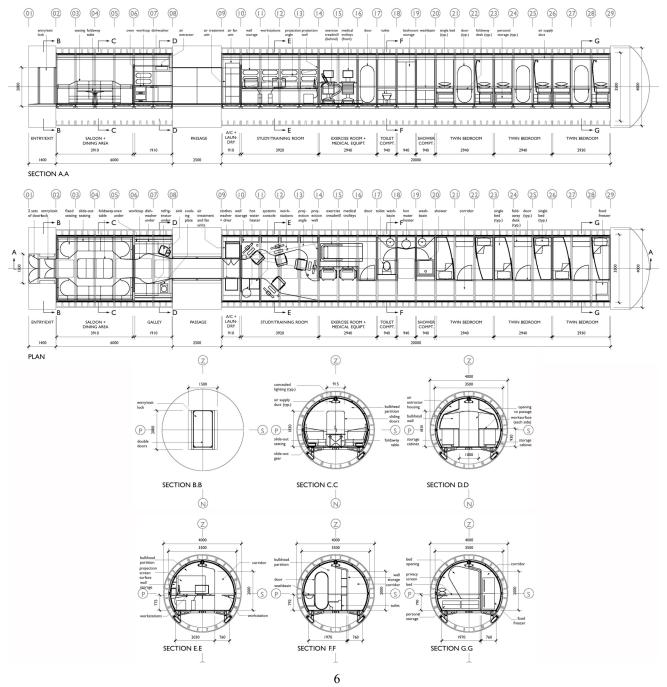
Plan and Sections showing the Laboratory Architectural Layout
